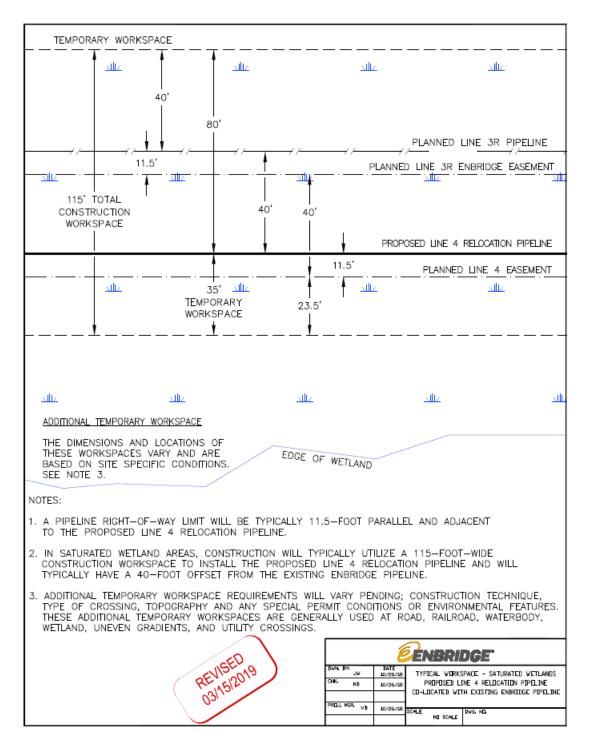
Option 5 Typical Construction Workspace Fond du Lac Band Reservation
